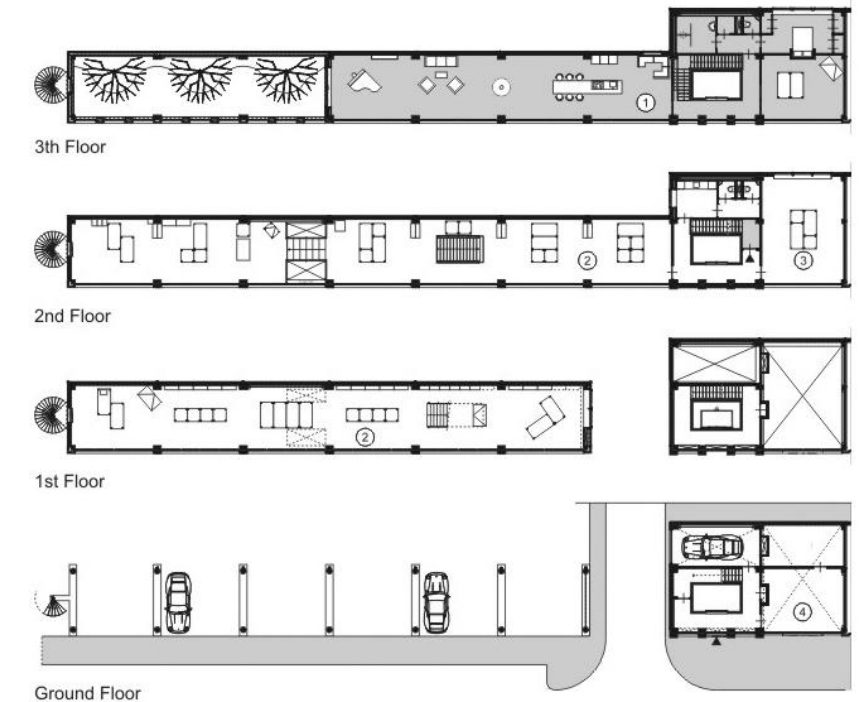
and 18: Office and architect’s dwelling on Boomgaardsstraat, street view and plans - Source: <https://www.miesarch.com>
